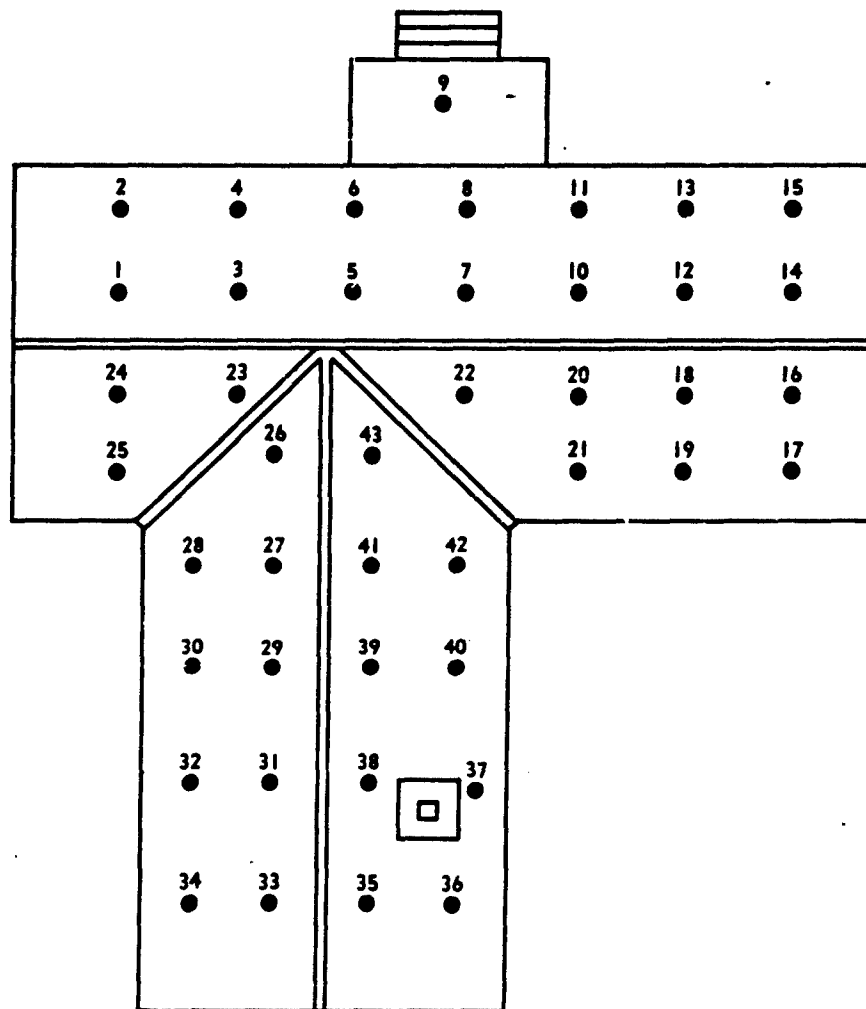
Location of Reading Stations on Roof of Building on the Complex
